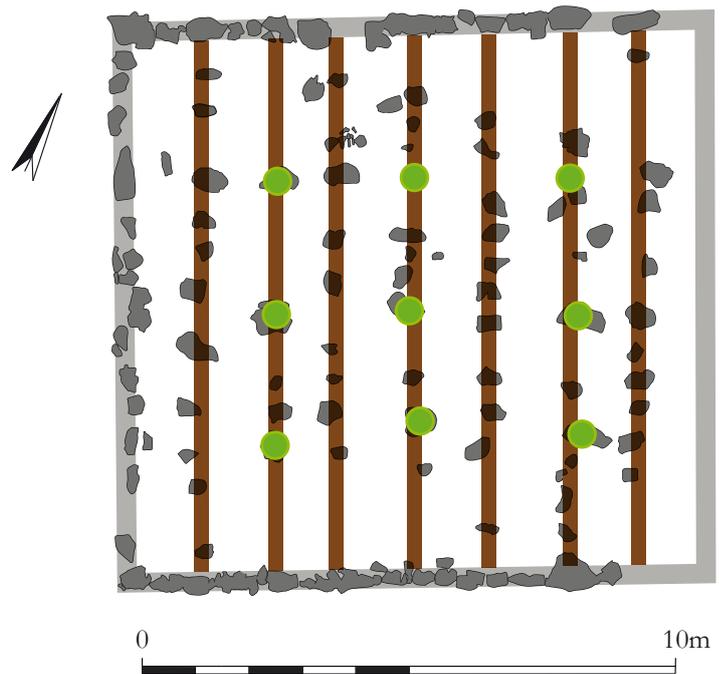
Site P4 – plan of the remains with a suggested reconstruction of the raised floor timbers and location of the timber posts supporting the roof - scale 1:150.
